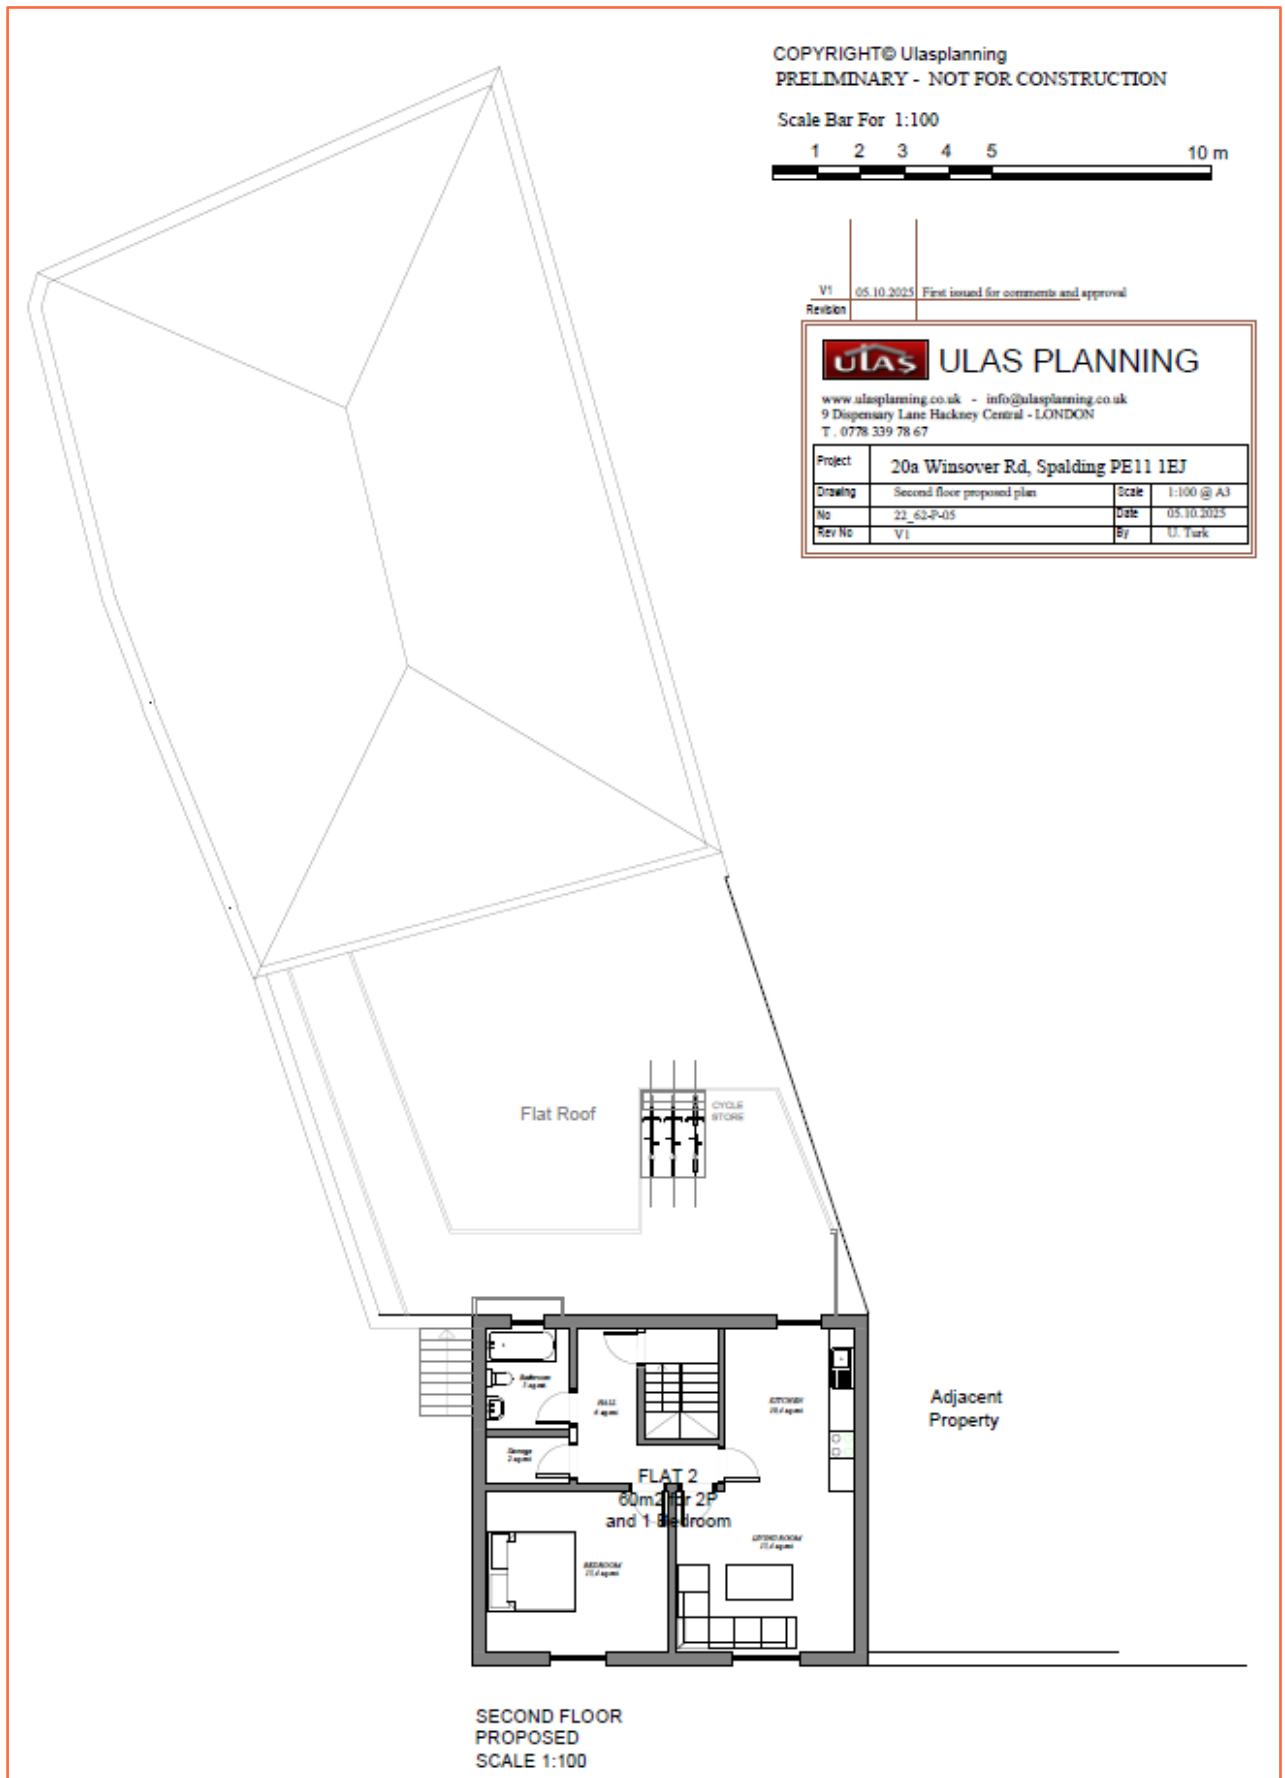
Proposed second floor plan (Source: ULAS Planning)
